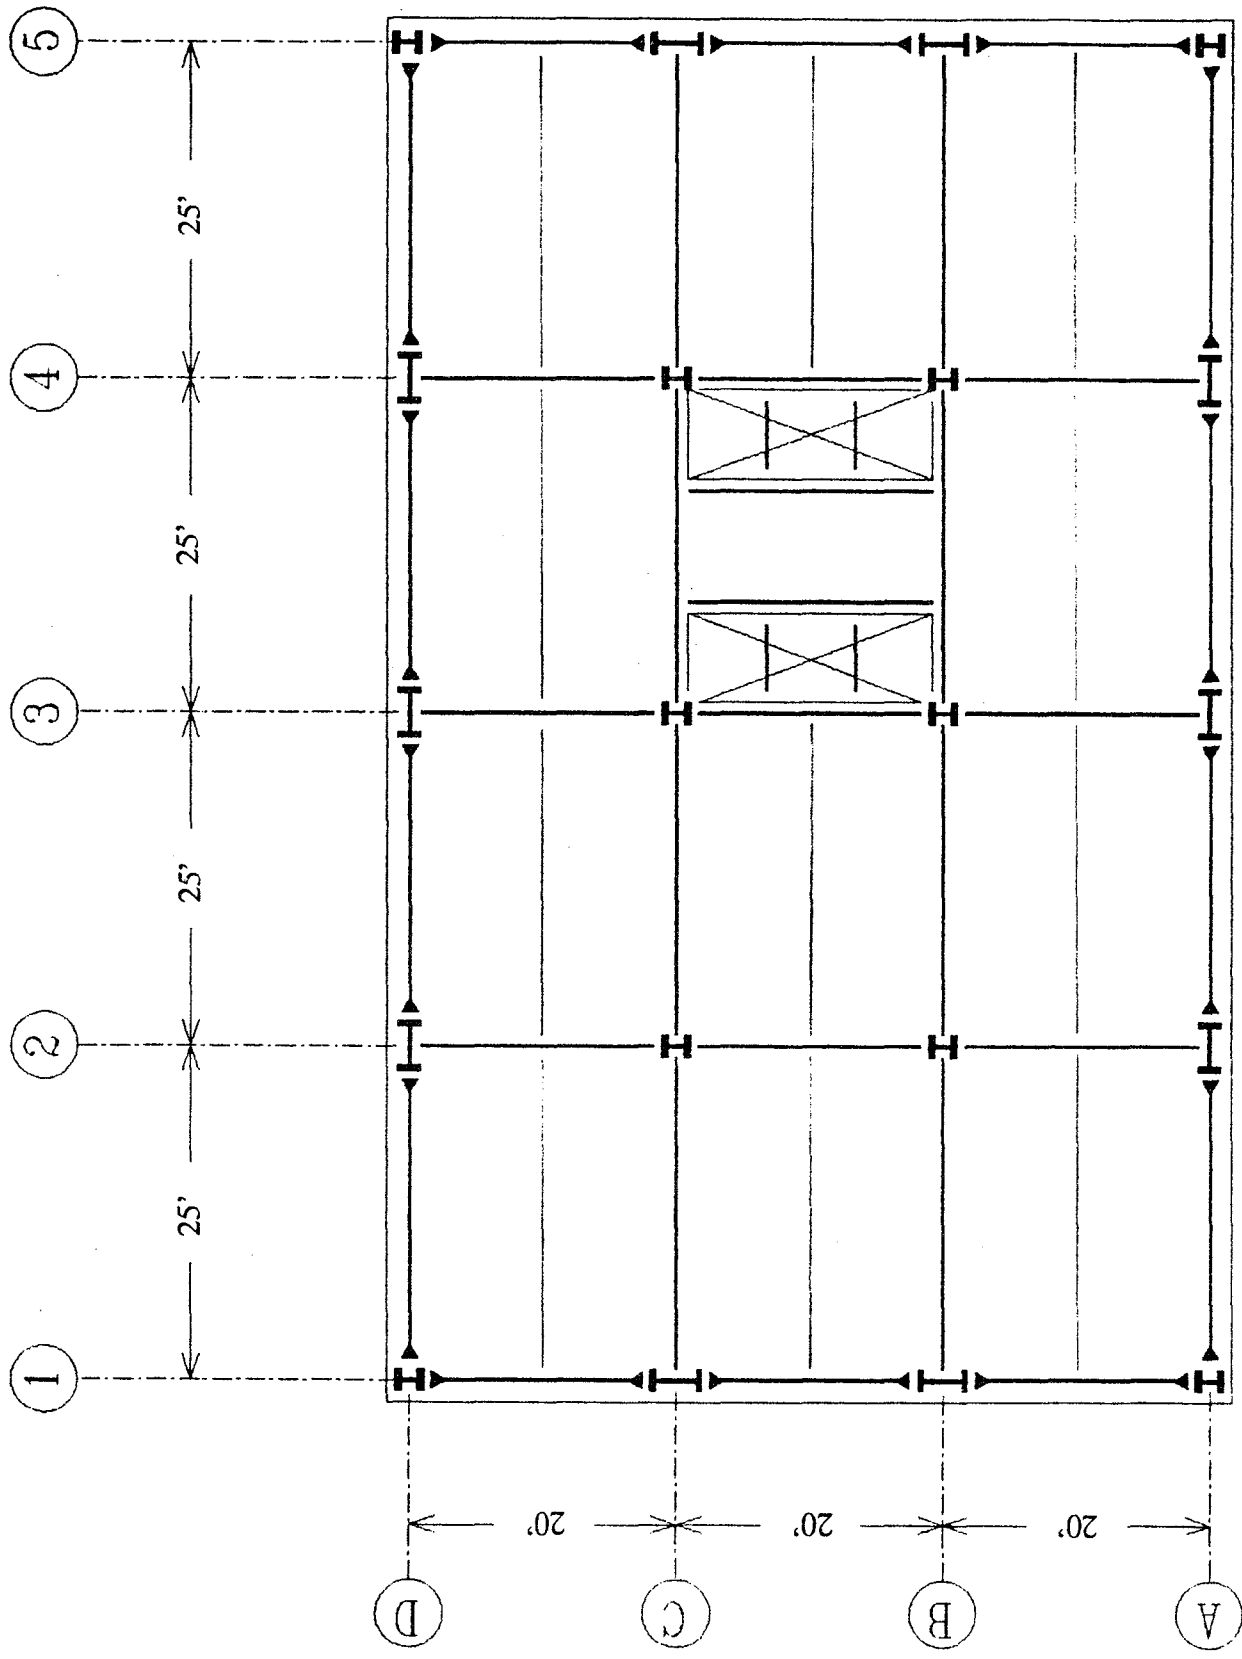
Typical Floor Framing Plan for The Twenty-Story Office Building
